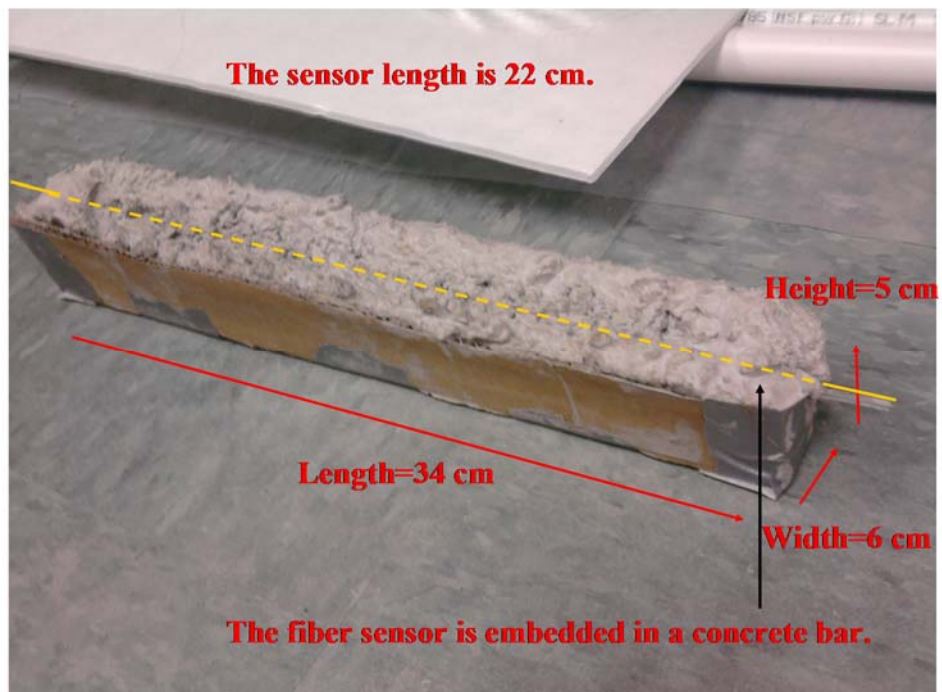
A concrete bar with an embedded EF-FLRD water sensor.
